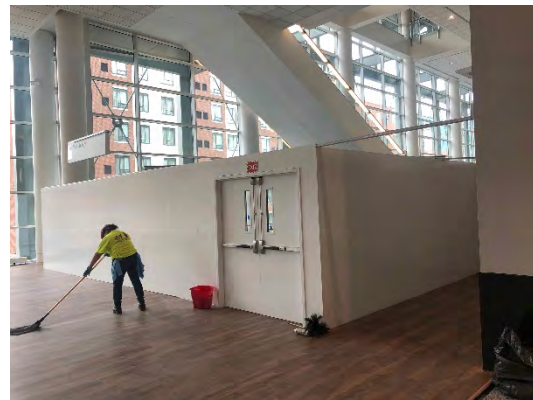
Patient Respite Area – New Vinyl Flooring and Wall Separating Patient Discharge Area
